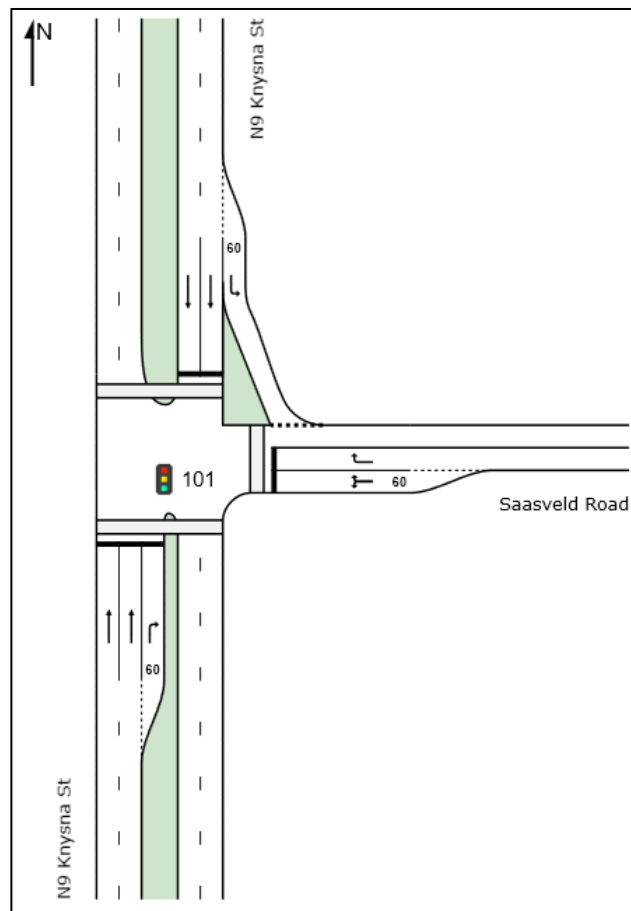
Layout: N9 Knysna Street & Saasveld Road
